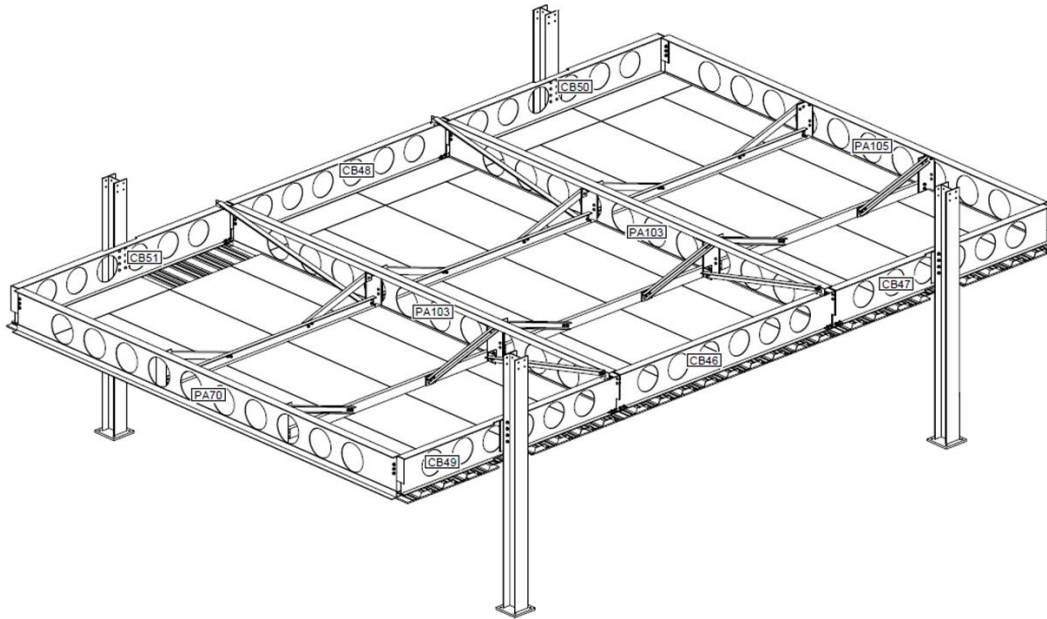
General arrangement drawing of SAISC cellular steel beam structure (Courtesy of SAISC)
